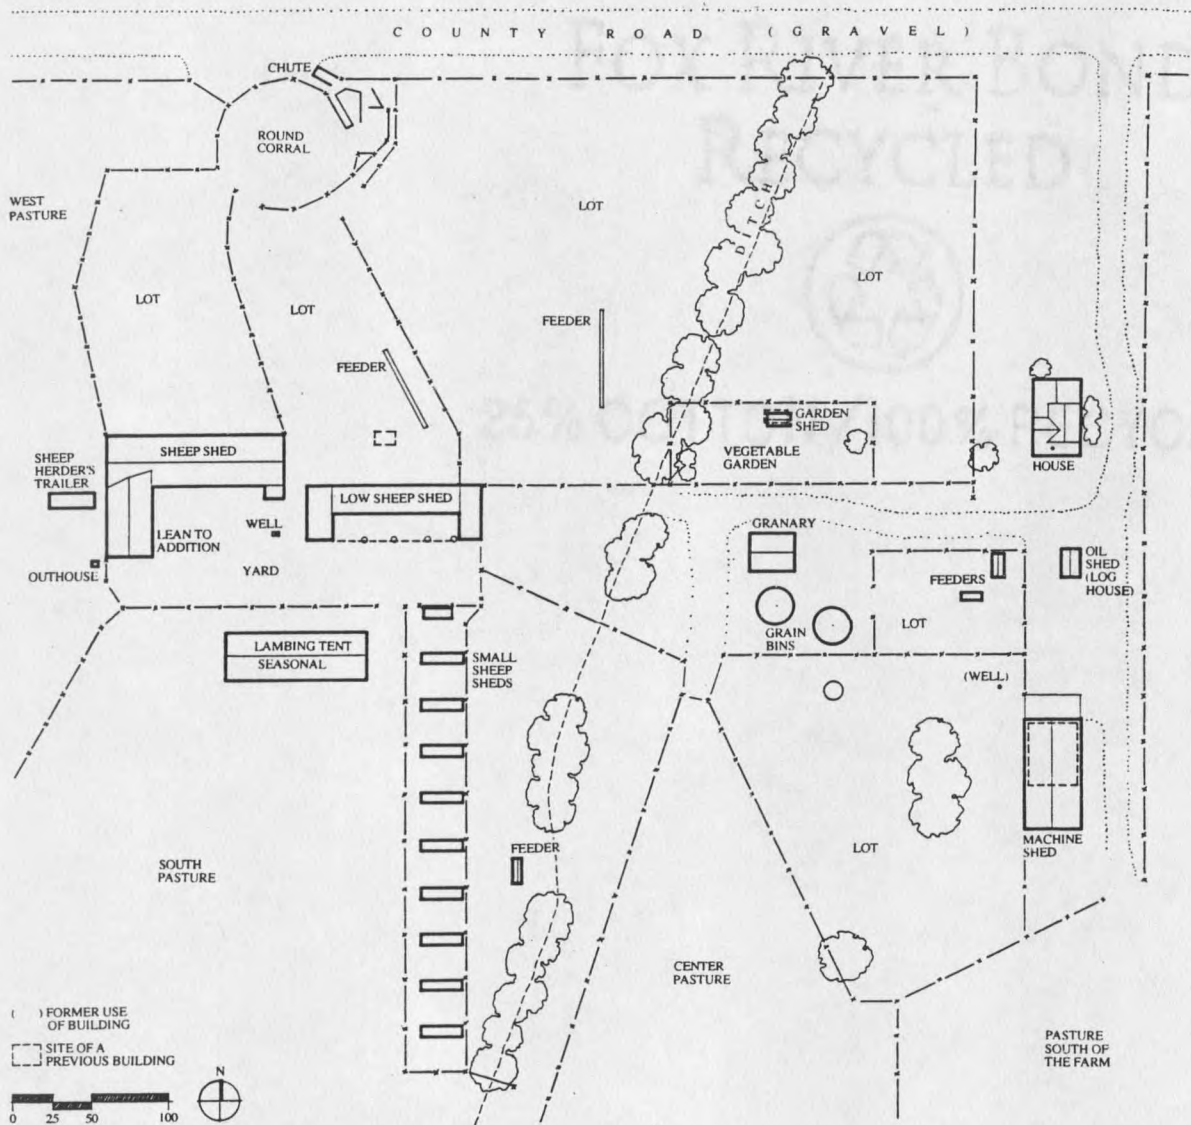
Site #3 - Site plan from 1978 to 1997. Twelve new buildings were constructed, including the seasonal wall tent for lambing, and multiple small sheep sheds.
